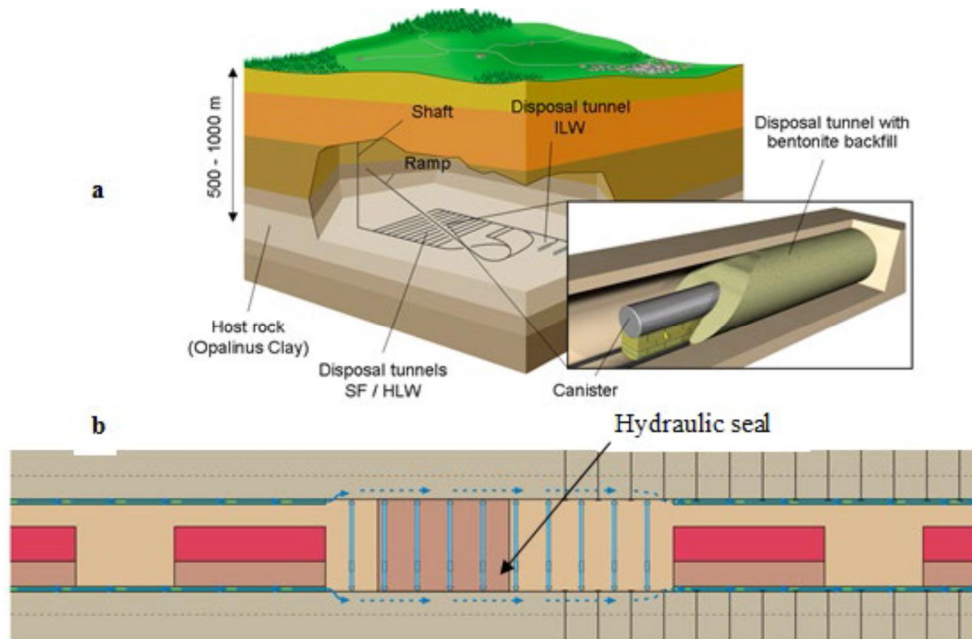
Nagra HLW repository concept: (a) repository layout and detail of Engineered Barrier System; (b) longitudinal section of emplacement tunnel showing liner and hydraulic seal.
